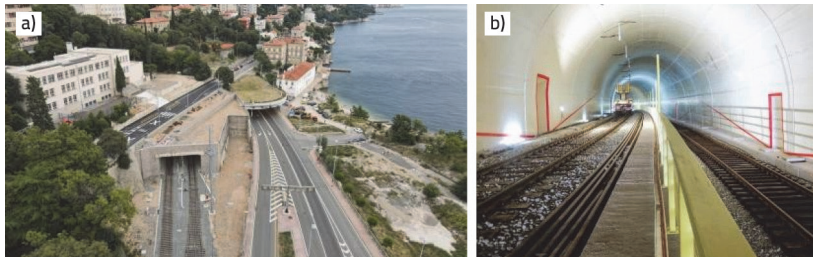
a) Entrance to the renovated and extended railway tunnel Brajdica beside the road tunnel Pećine, b) Finished expanded railway tunnel [3]
